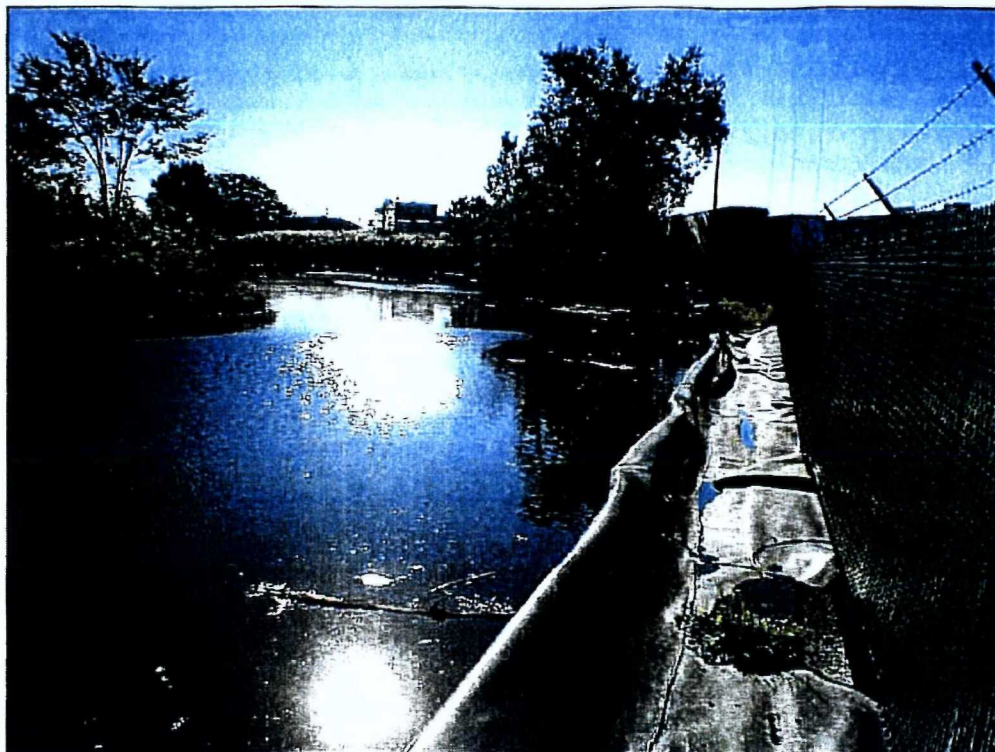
Photo G – View, facing southeast, of the existing sheet pile bulkhead adjacent to Peach Island Creek.
